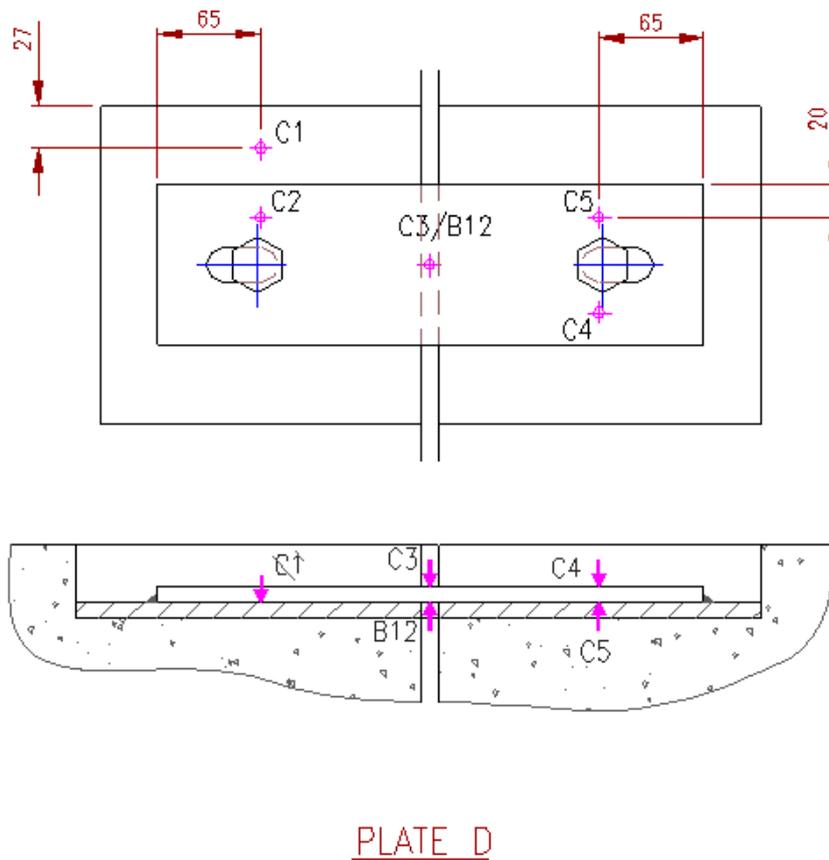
Butt-joint of slab construction detail as tested in WFRA 40938
